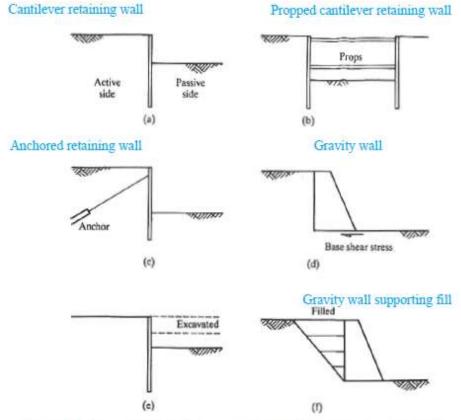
Principle types of retaining structure (Atkinson, 1993)
